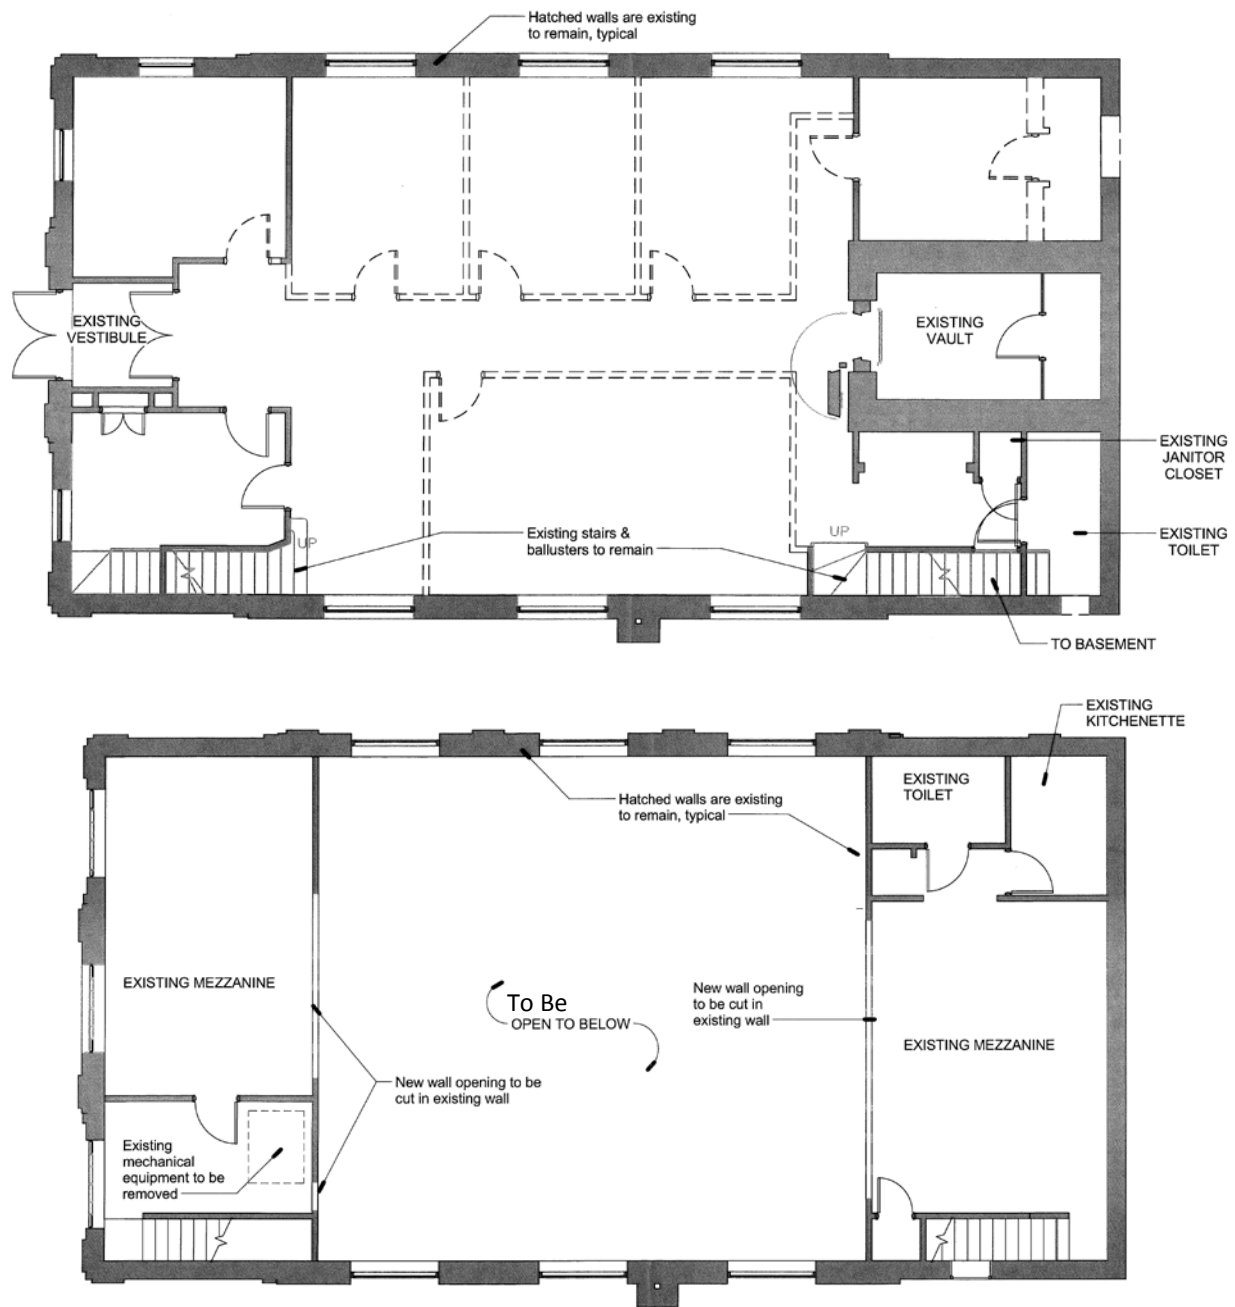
Pre-rehabilitation project plans, showing main and mezzanine levels. The main level plan shows interior partition walls that were added after the building no longer functioned as a bank, and was converted to offices. Those and the suspended ceiling were all removed during rehabilitation project, exposing original finishes.
